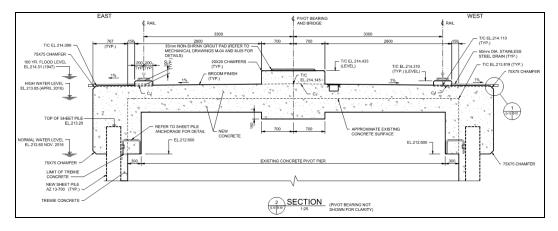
Pivot Pier Rehabilitation and Retrofitting with Sheet Piles Similar to the Rest Piers
